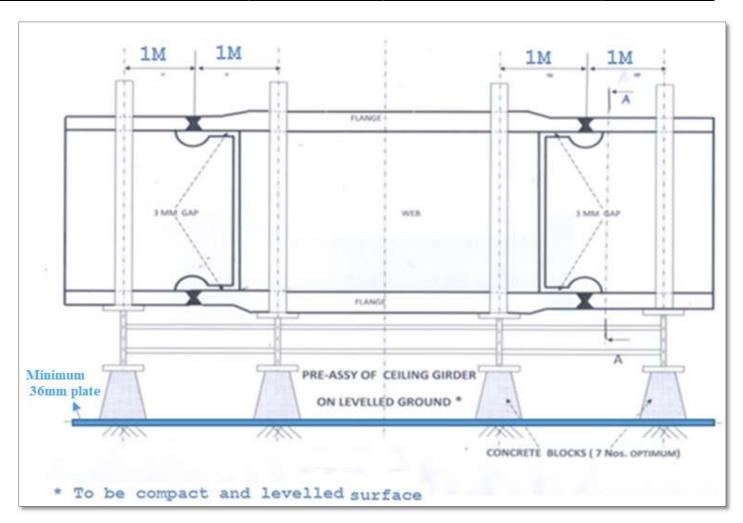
PRE-ASSEMBLY OF CEILING GIRDER ON CONCRETE BLOCKS
